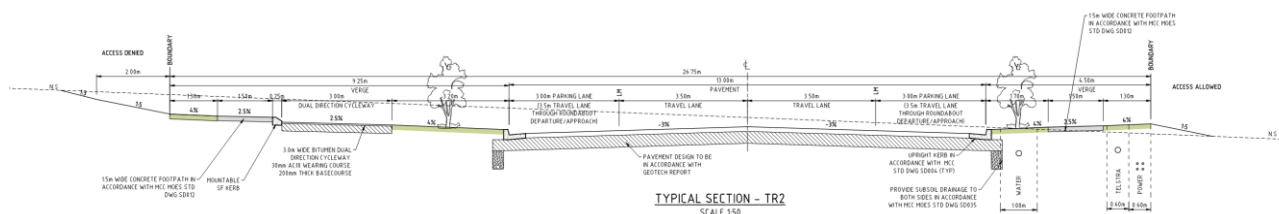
Proposed Typical Cross Section of the Perimeter Road (Source: GCA Engineering Solutions, Note: NOT TO SCALE in this Report)
